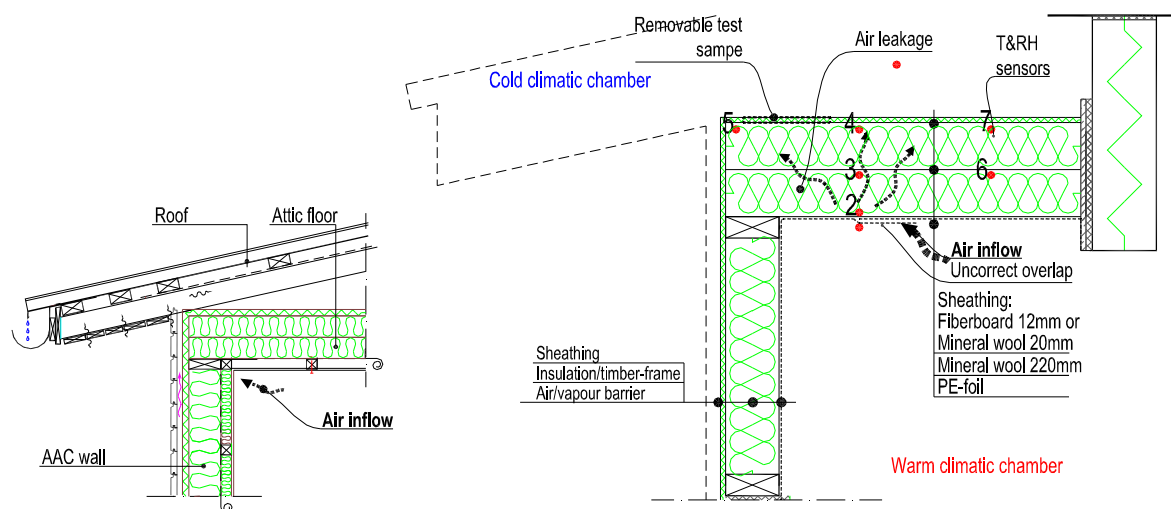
Studied timber-frame wall joints with timber-frame attic floor (left) and the studied joint in laboratory conditions between climatic chambers (right). Temperature and RH measurement points are shown by red dots.
